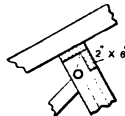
Construction at Purlins.—Scale, $\frac{1}{4}$ Inch to the Foot.
